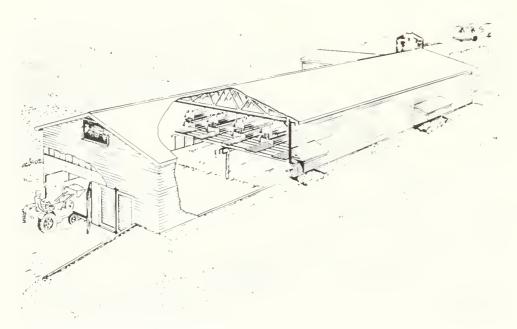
Deep pit caged laying house (CPS Plan 5211)
